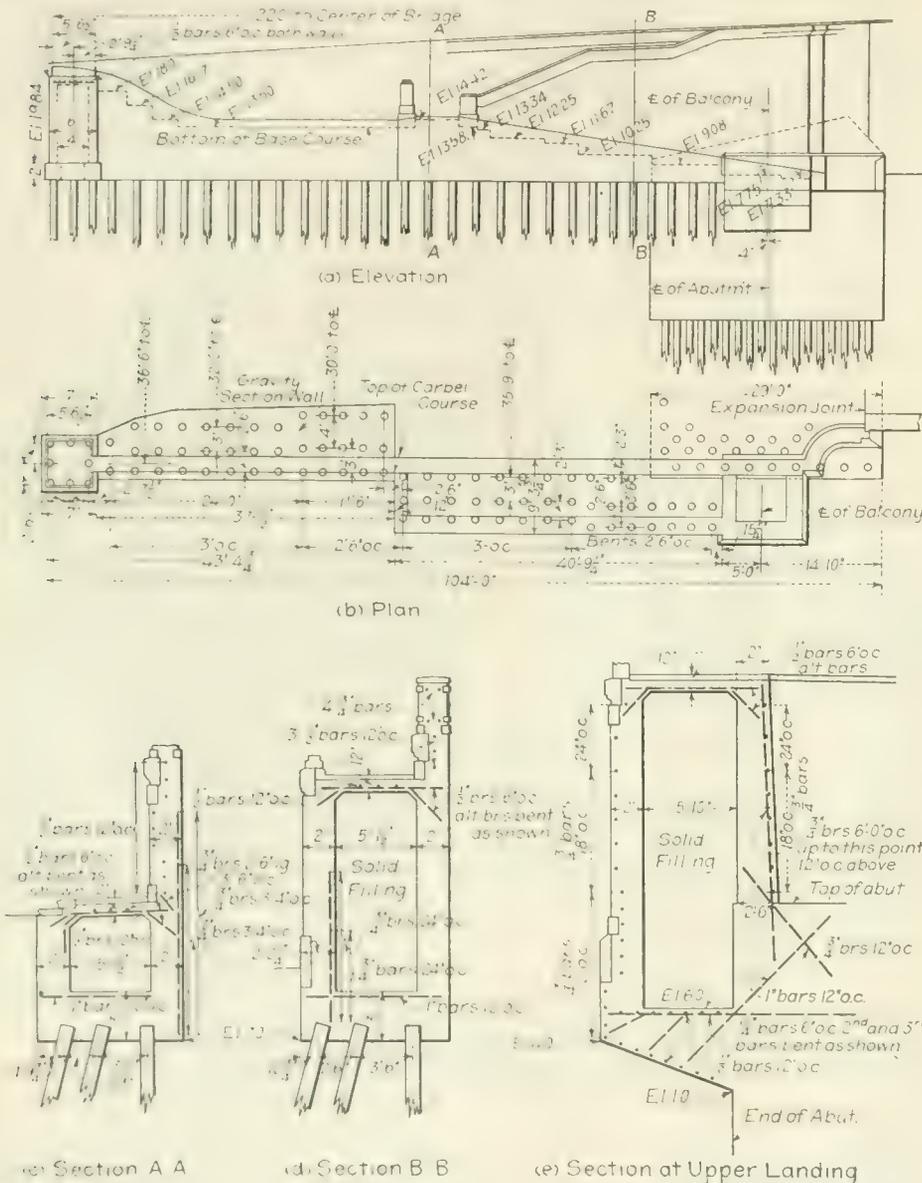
Elevation, Plan and Cross Sections of West Wall and Stairway of Cambridge Approach of Larz Anderson Bridge.
